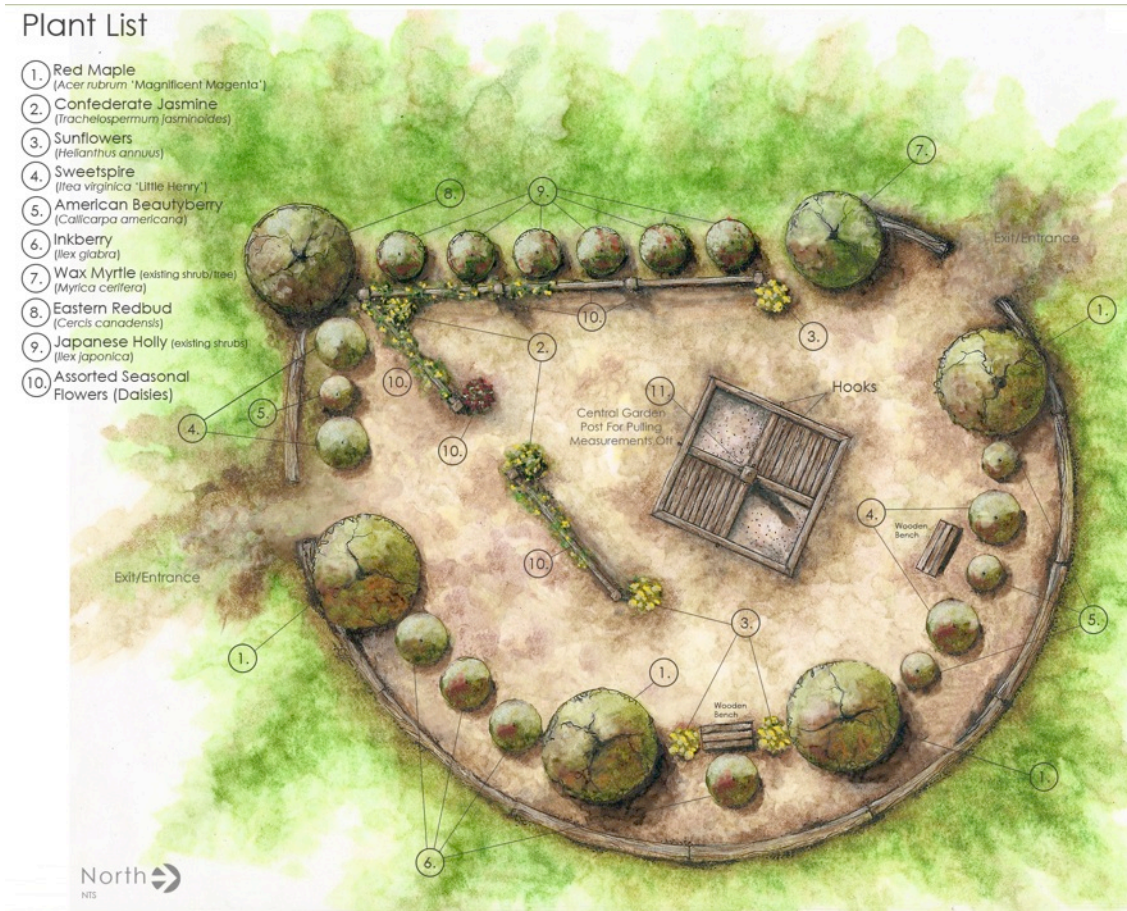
The final master plan with planting details for the Dacusville Middle School math garden
